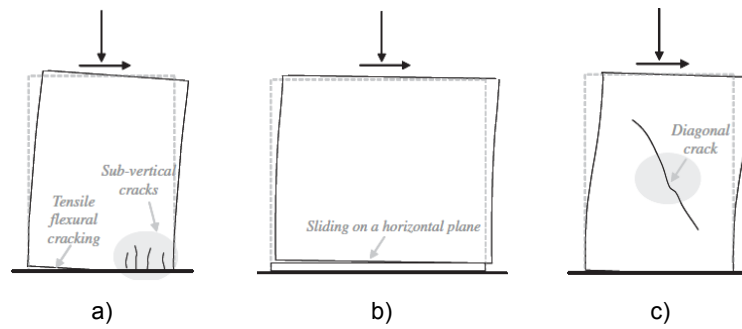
Typical failure modes of masonry walls in their plan (Calderini *et al.*, 2009): a) Rocking; b) Sliding Shear; c) Diagonal Cracking.
